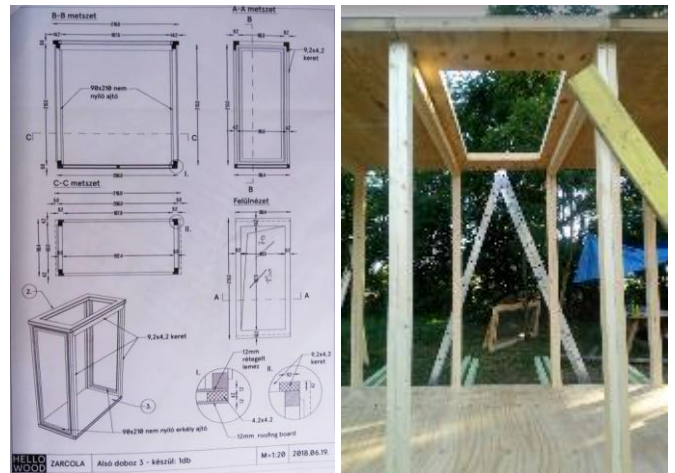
The structural drawing detailed of a frame unit by HelloWood as a handout to follow assembly.
